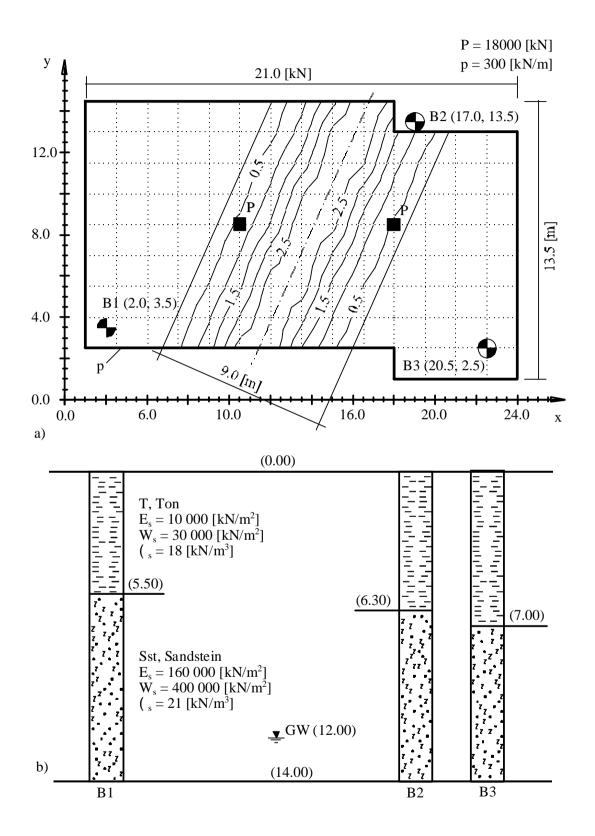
a) Plan of the raft with settlement lines through the underground tunnel and boring points b) Boring logs BPN1 to BPN3
